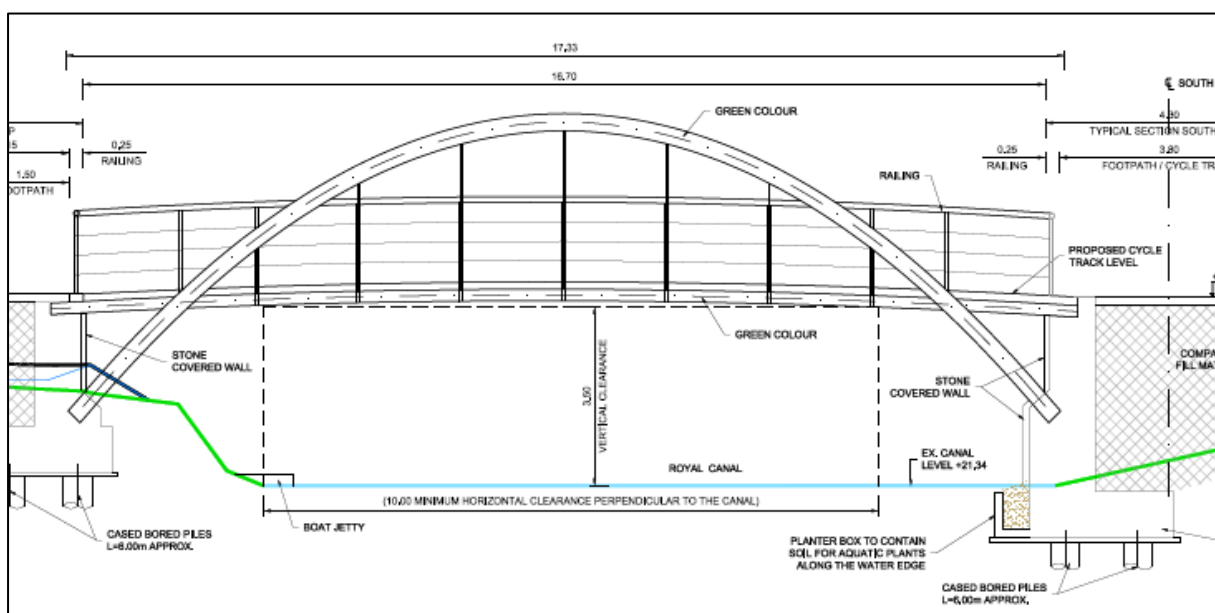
Elevation of the Proposed Royal Canal Footbridge
